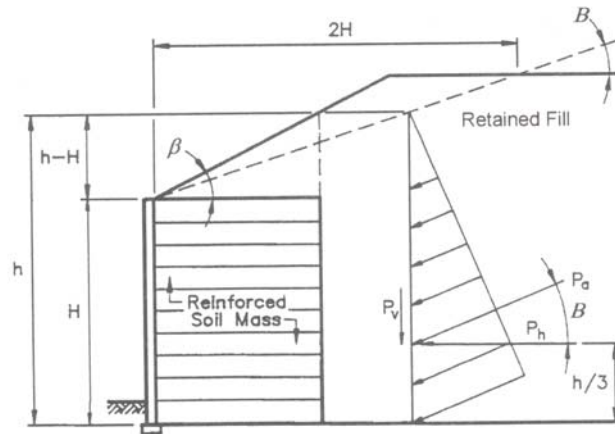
AASHTO Figure 3.11.5.8.1-3 – Earth Pressure Distribution for MSE Wall with Broken Back Backfill Surface
